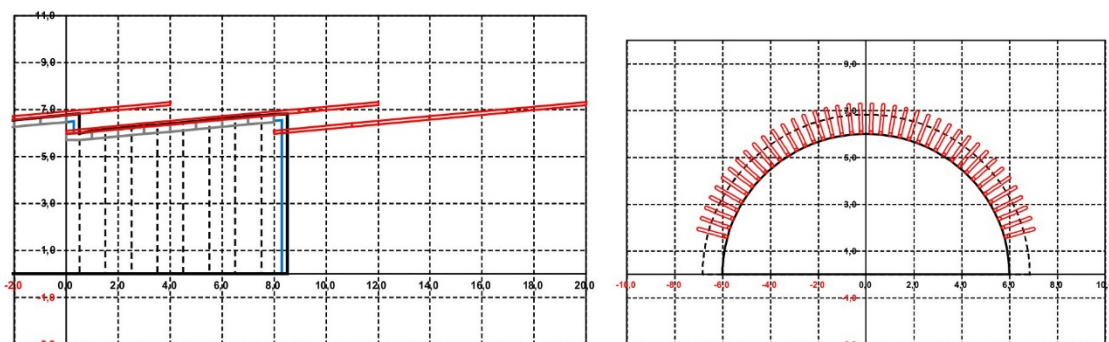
longitudinal and cross section of an exemplary pipe umbrella.
